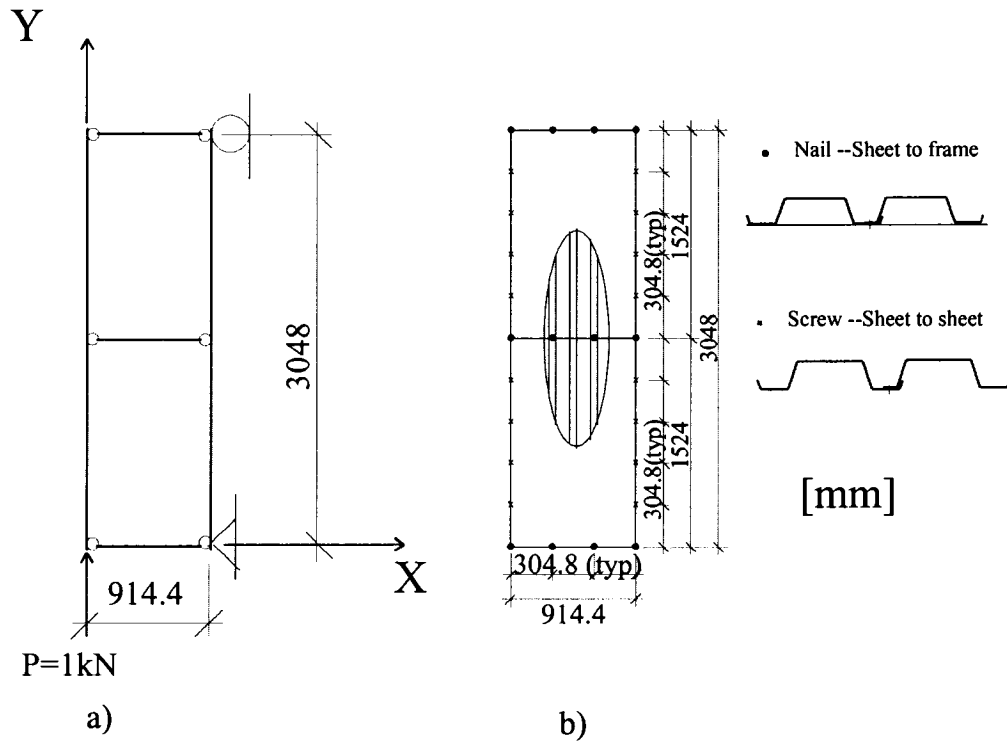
Cantilever analysis model; Frame & joists (left); Sheet layout (right)
